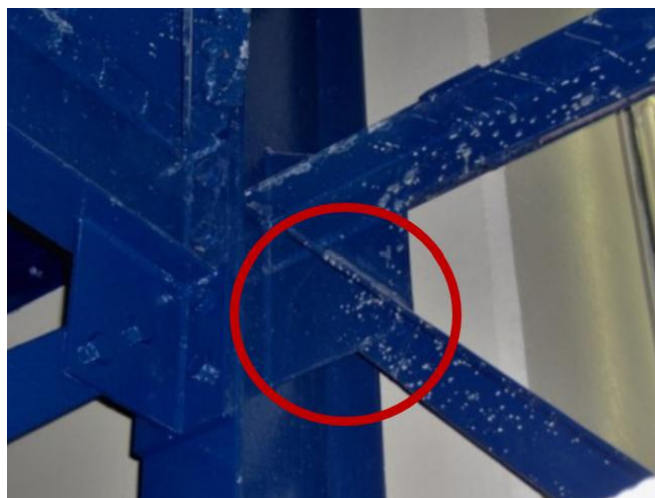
Welded Angle-to-Gusset Connection in a Steel Bracing System [141]
